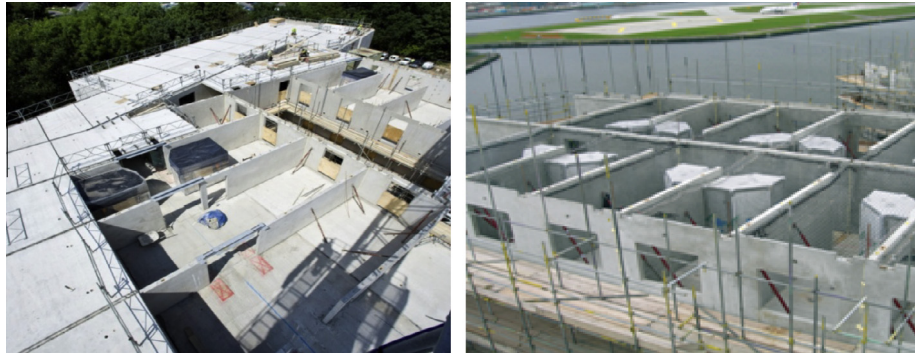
Examples of precast concrete wall construction (courtesy of Bison).
